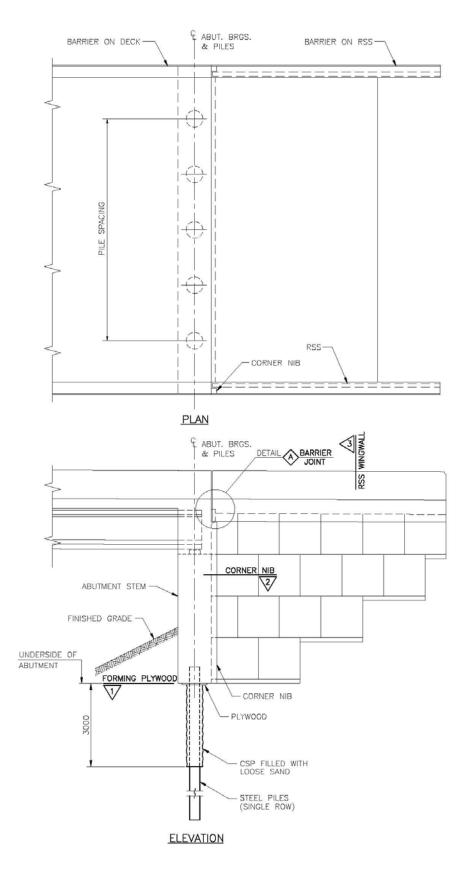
Integral Abutment with RSS Wingwalls. For Section 1, 2, 3, see Figures 5.5, 5.11, and 5.1 respectively. For Detail A, see Figure 5.14.
